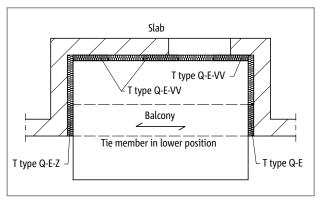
Schöck Isokorb® T type Q-E, Q-E-Z and Q-E-VV: Recessed balcony supported on three sides with tie member
